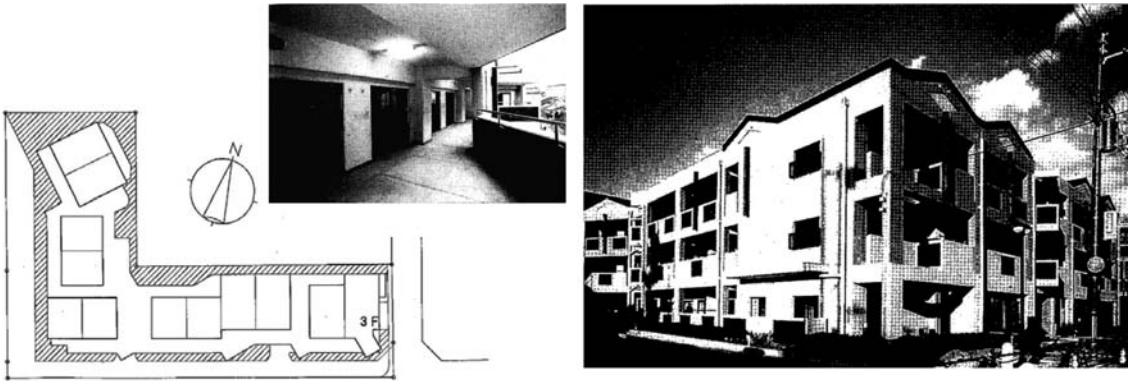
Building façade of Mano Fureai-Jutaku. The wide balcony-like passages are located on the second and on the third floor, shown; the common rooms are located on the ground floor. (Source: City of Kobe)
